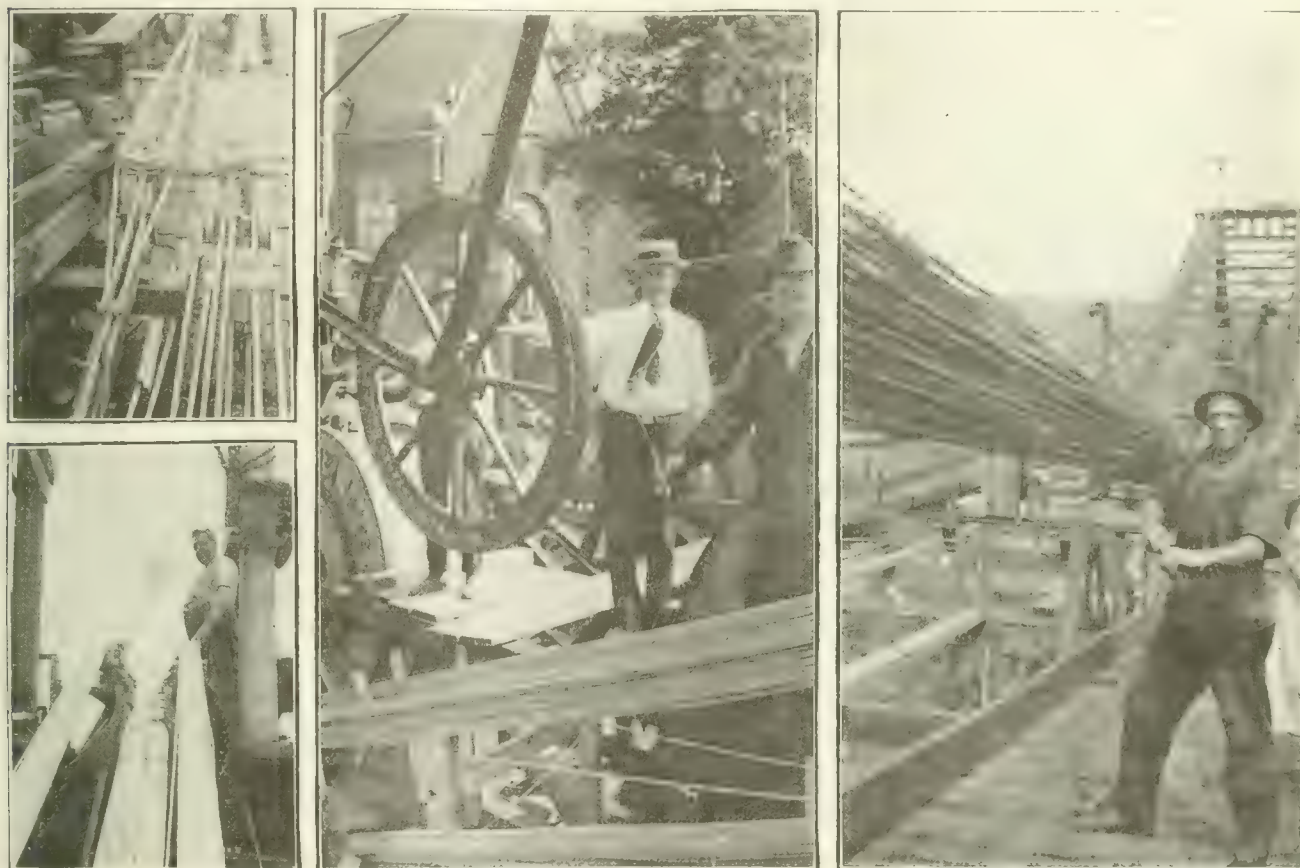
CABLE-SPINNING OPERATIONS ON THE RONDOUT CREEK BRIDGE
